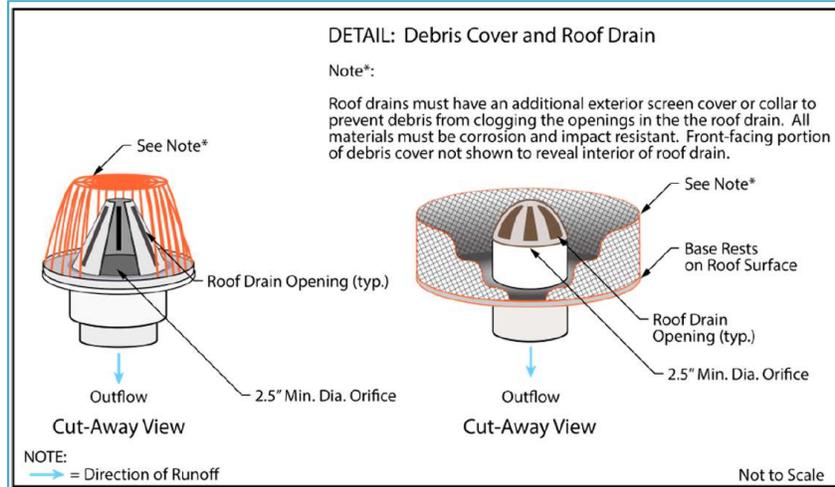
Detail of a exterior screen cover to prevent leaves and other debris from entering and clogging roof drains³⁶.
